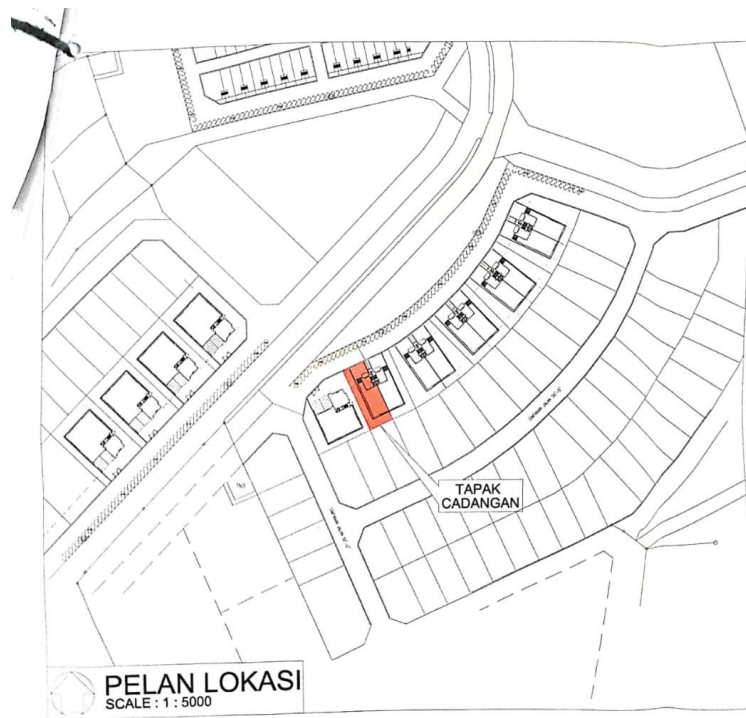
Location plan of Boon Lee Auto SDN. BHD
